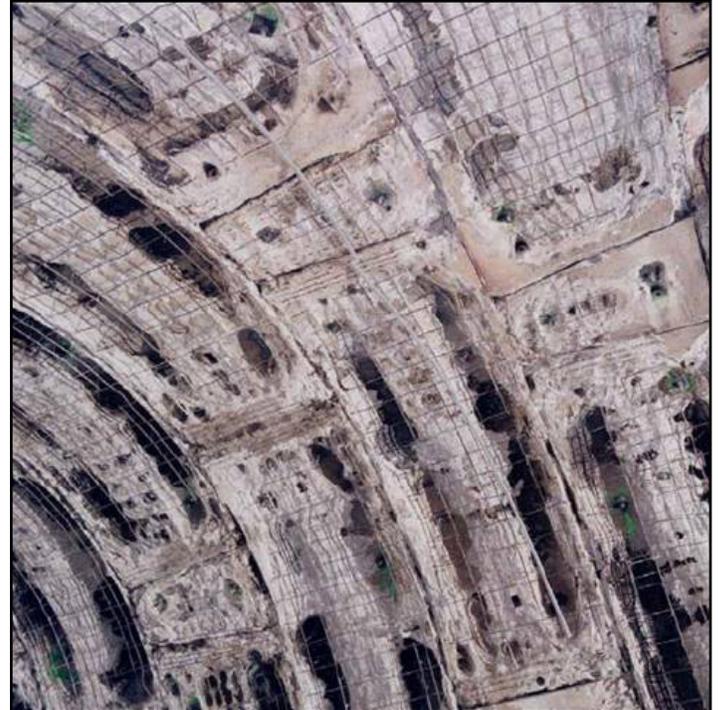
Fire induced spalling damage in the tunnel lining of the Channel Tunnel between England and France.
